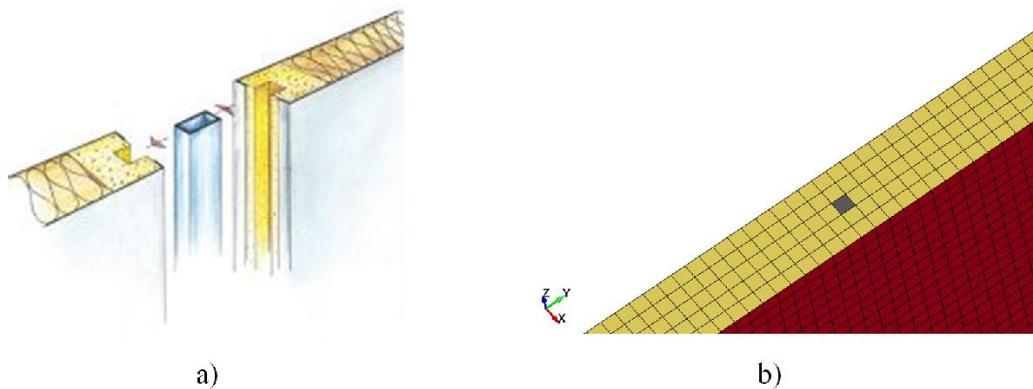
a) Cross section and design of the wall panel, b) FE model of the impacted wall.
